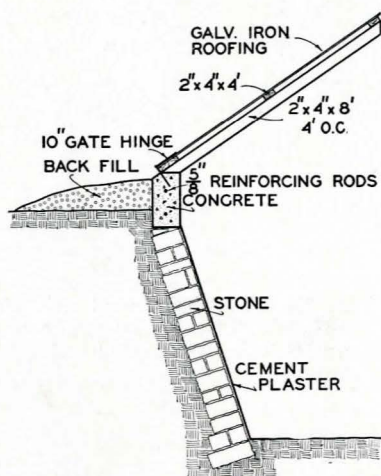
If stone walls are used the thickness should be about 12 inches. Two or more coats of cement plaster will give the walls a smoother finish.
